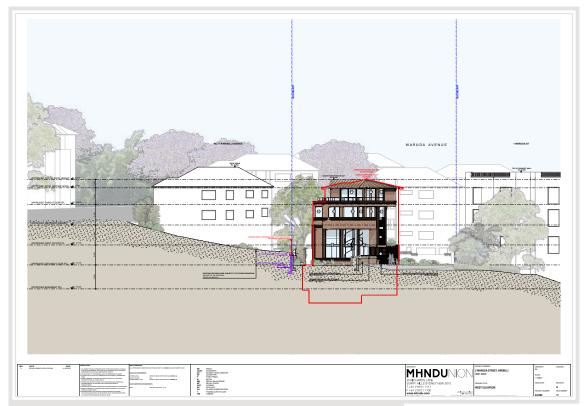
Elevations of the proposed design by MHNDUnion Architects.
